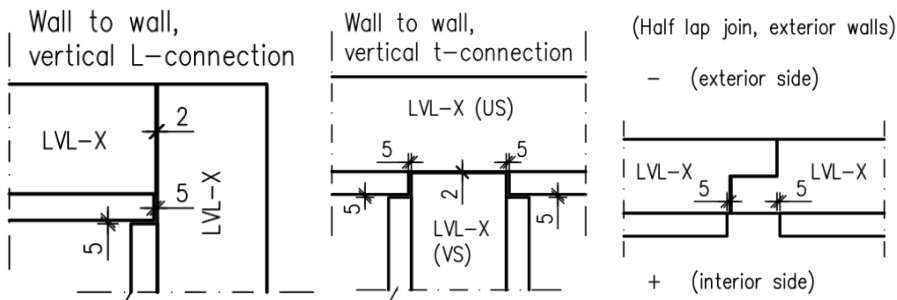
Tolerances used for CLT-support beams installed at prefabrication of elements. Courtesy of A-Insinööri Oy, Joensuu
